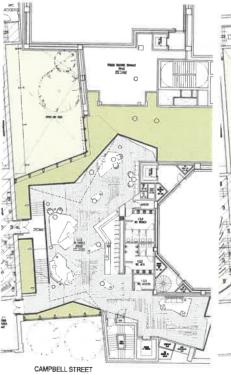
Foyer floor plan - Level 3 Lobby and bar highlighting voids (in green) abutting the TR heritage wall.
